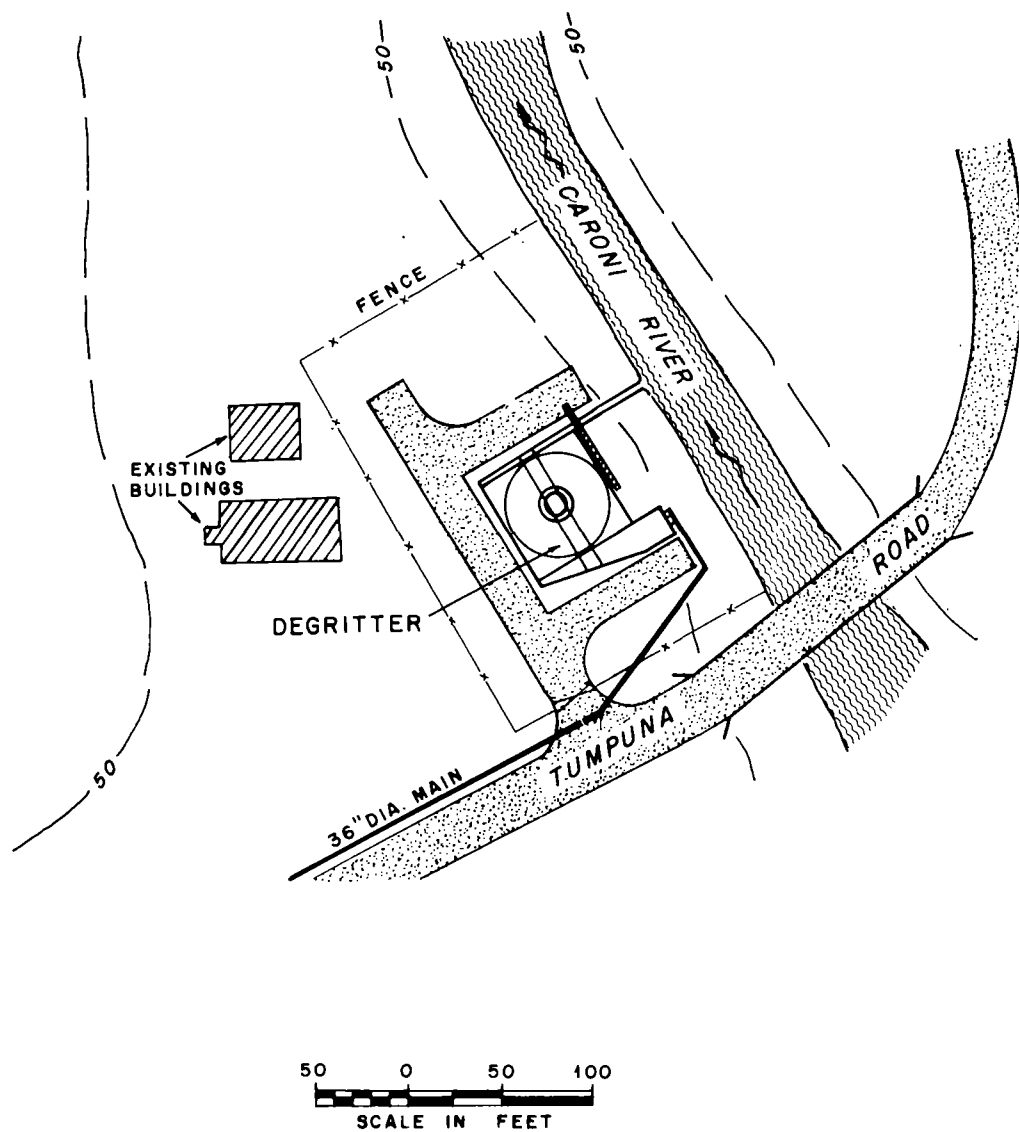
SAN RAFAEL INTAKE – SITE PLAN
